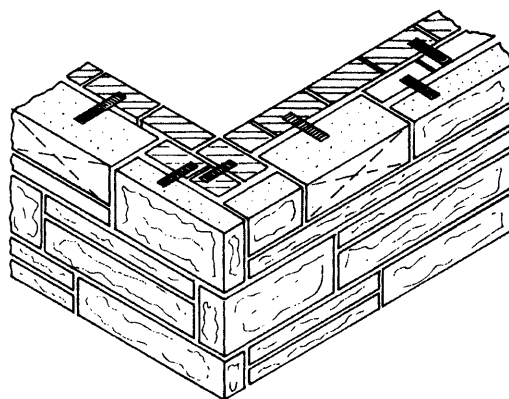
Concrete masonry pattern bonds. (Courtesy of Portland Cement Association)
